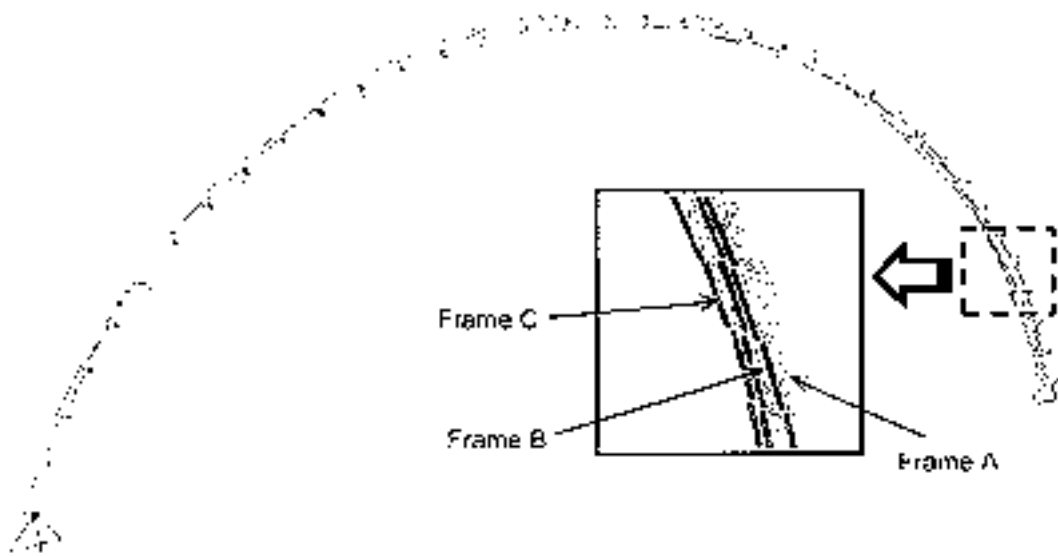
Building F. SAP2000 Model of Composite Wood Arched Frame
